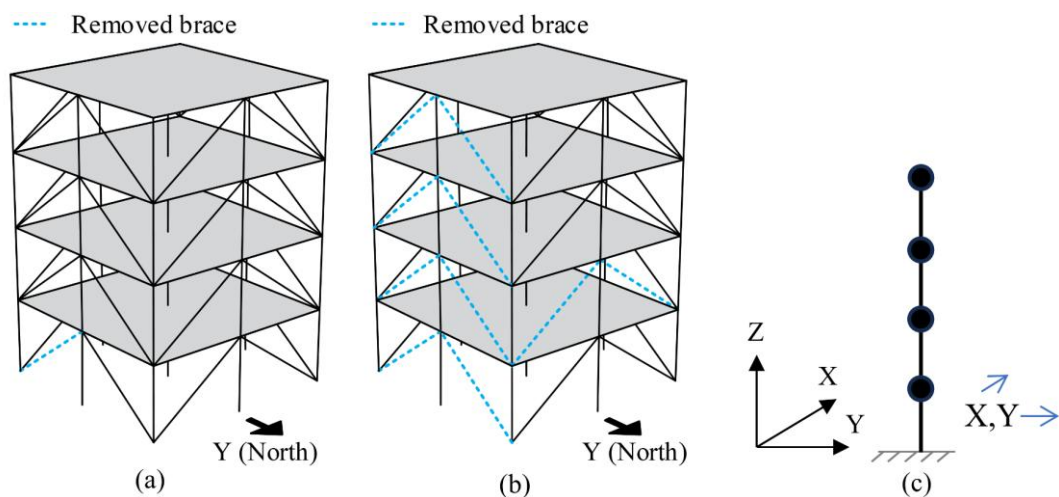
Damage scenarios: (a) removing braces on the first floor in one bay at the southeast corner and (b) removing braces on all floors on the eastern side and on the second-floor braces on the northern side. (c) the lumped mass model
